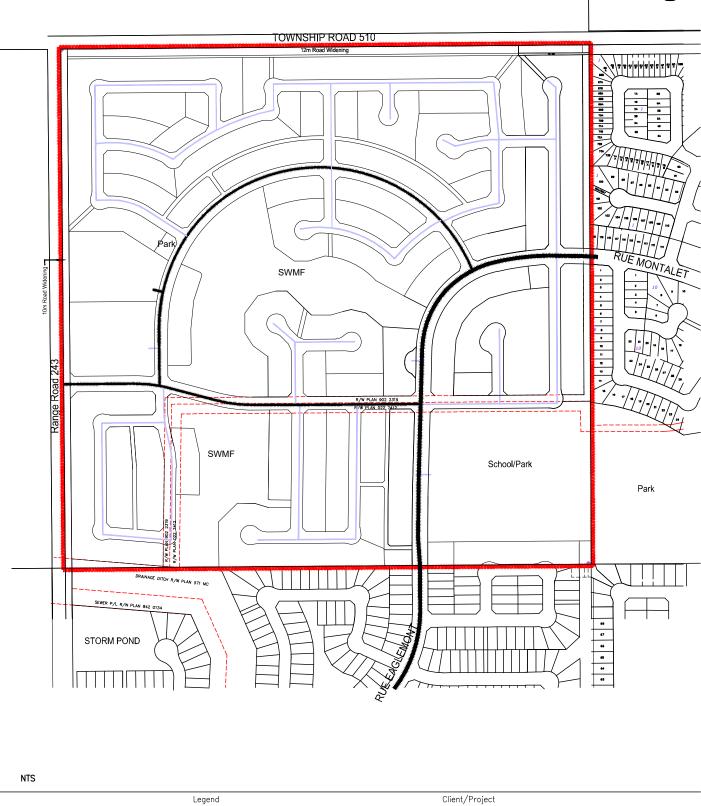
Water Distribution System, illustrates the conceptual water distribution system that consists of a 300 mm trunk water main aligned along the Ring Road and a 250 mm secondary trunk aligned around the central stormwater pond, connecting on either end to the 300 mm trunk water main. The balance of water main through the subdivision is proposed at 200 mm.
